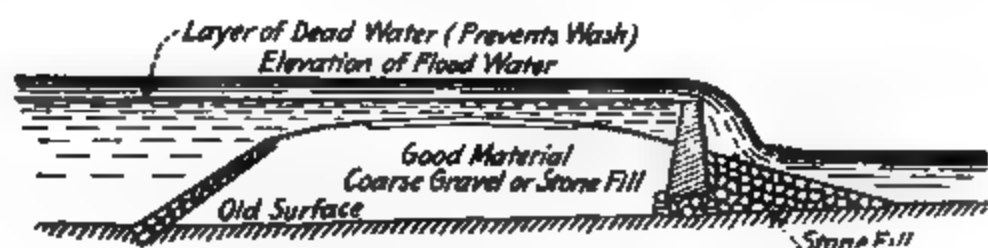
Method of Protection where Road cannot be raised above Flood Level
